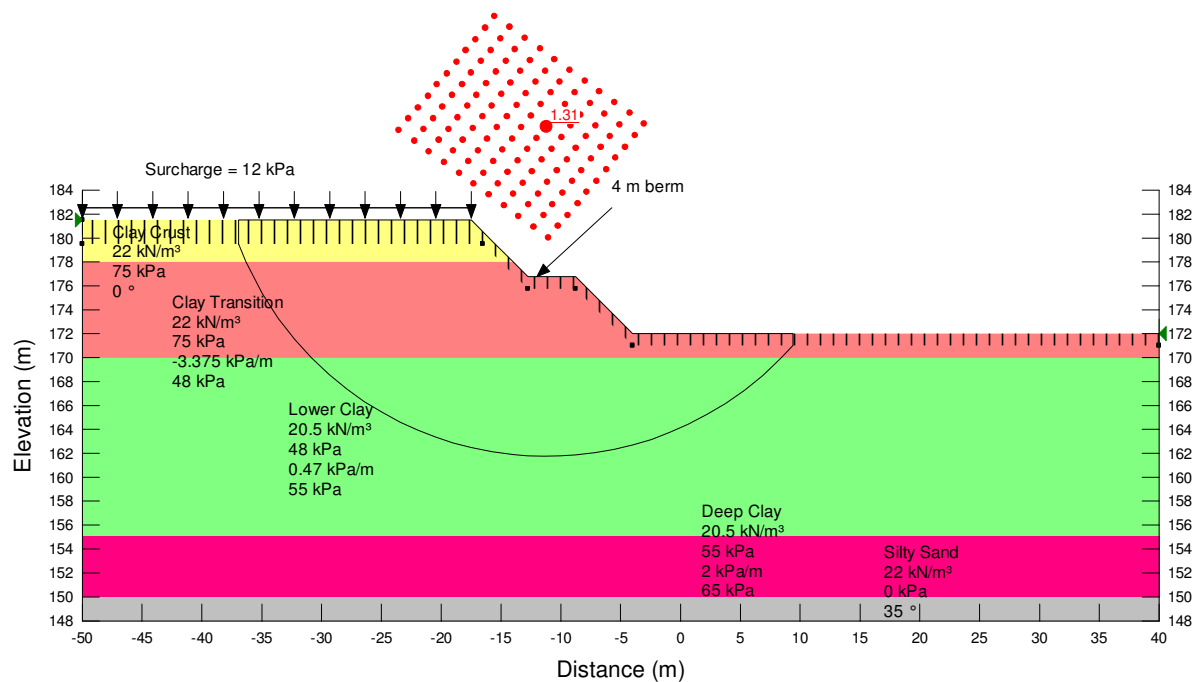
Slope Stability Model of Temporary Excavation for Concrete Box Structure B-8.
